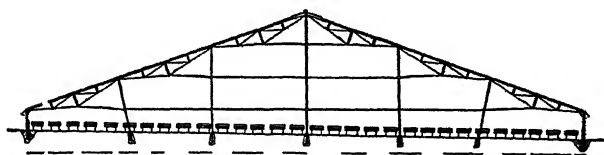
Section of combination truss-frame greenhouse, 172 feet wide.
